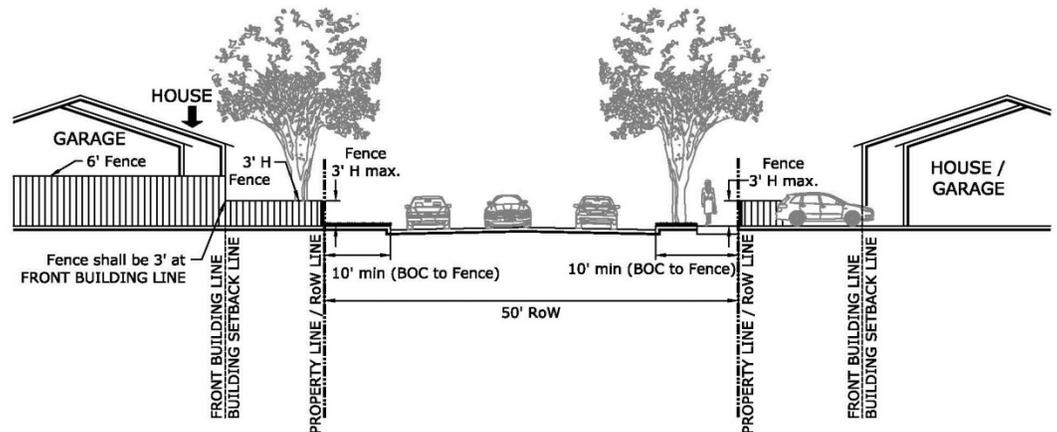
(e) – Typical Cross Section with NO Landscaped Area and Sidewalk
